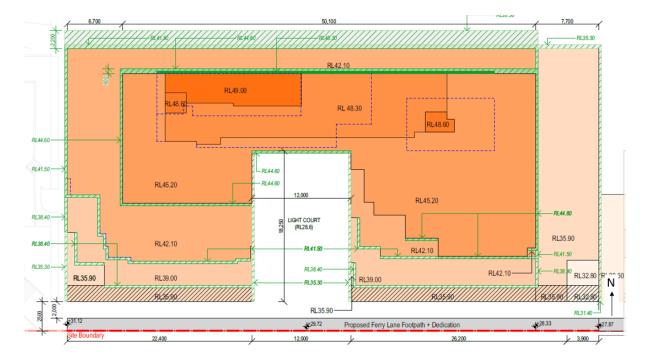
Proposed residential flat building envelope plan with articulation zones depicted in green
